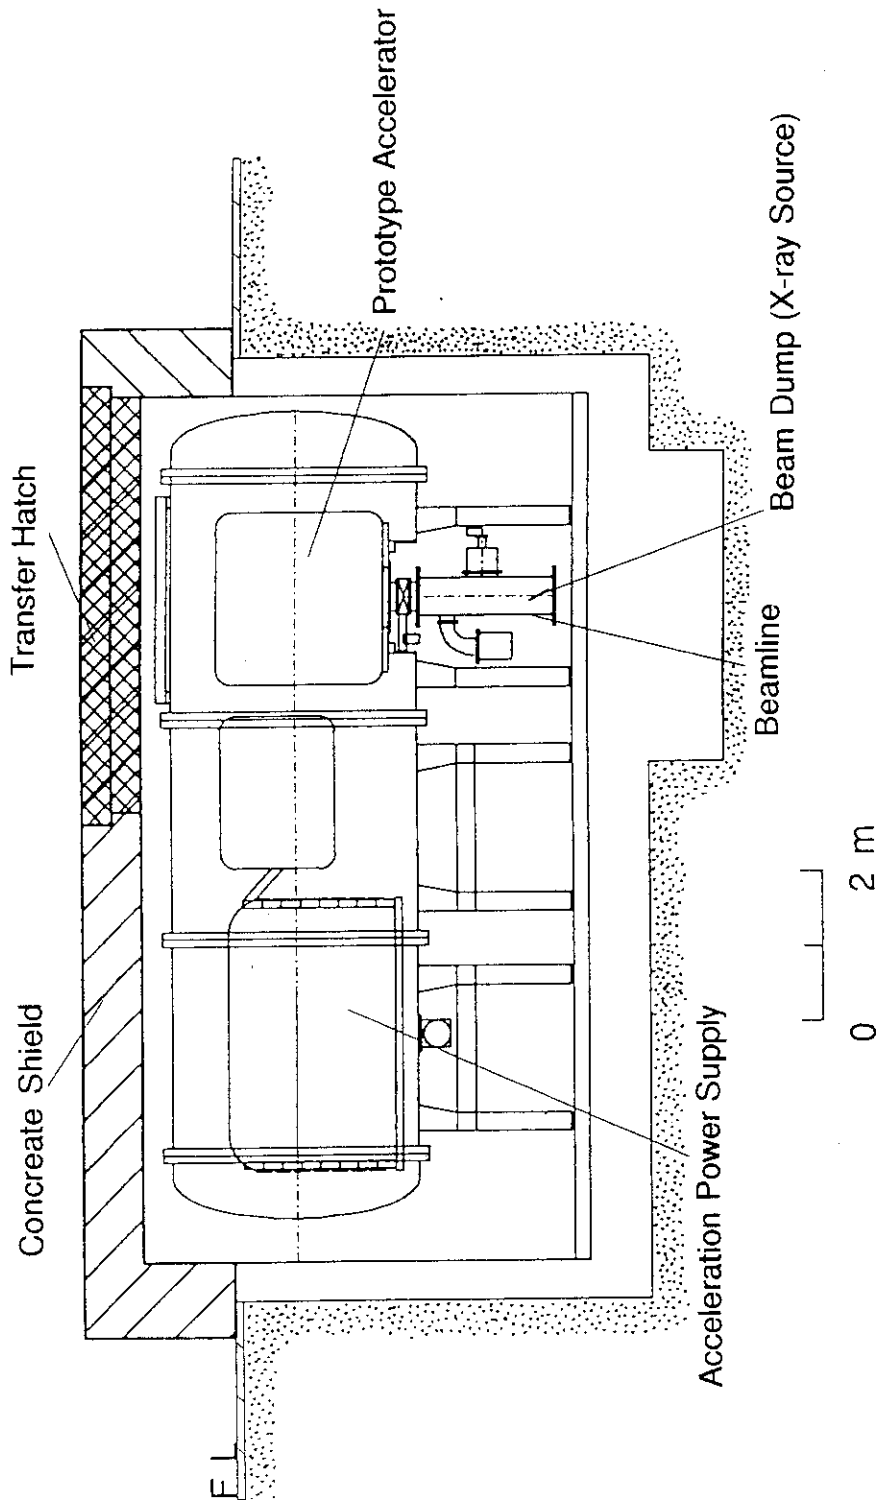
A cross-sectional view of MeV Test Facility
